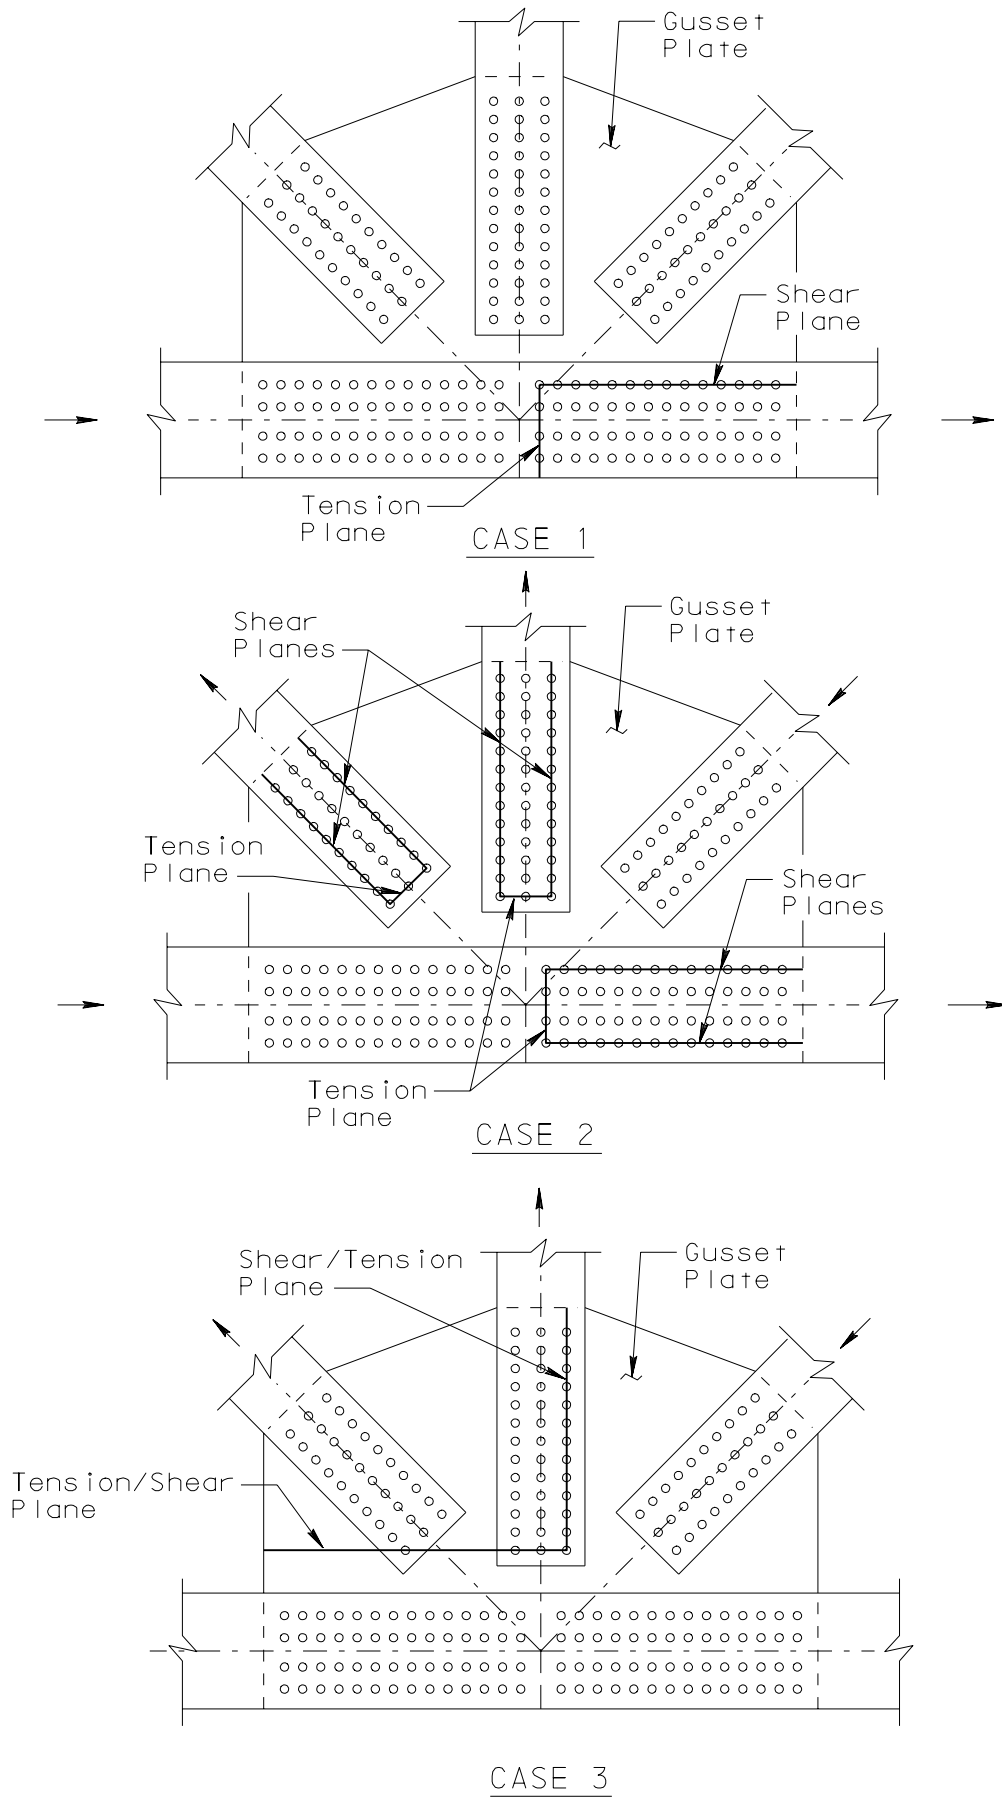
BLOCK SHEAR RUPTURE PLANES IN GUSSET PLATE IN TENSION
